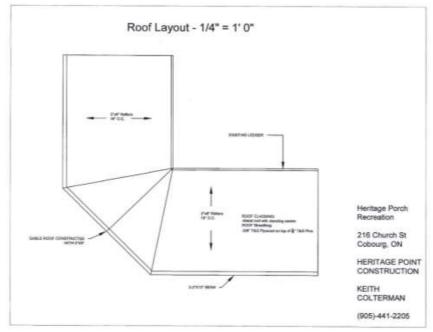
Roof layout for the porch re-creation Elevation - Scale 1" = 1'
